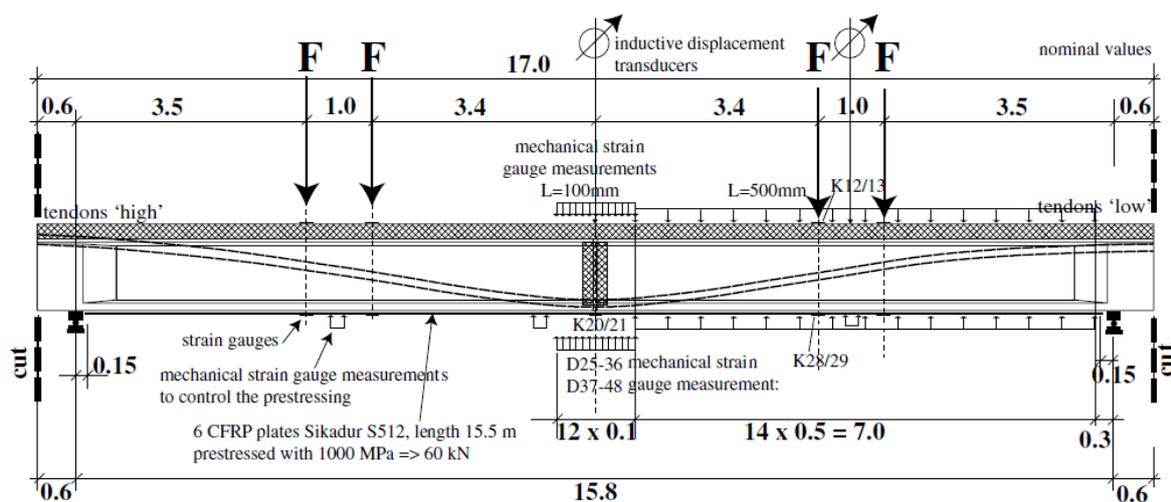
TEST SETUP OF A PRESTRESSED 40-YEAR-OLD GIRDER STRENGTHENED WITH PRESTRESSED CFRP PLATES, CZADERSKI & MOTAVALLI (2007).
